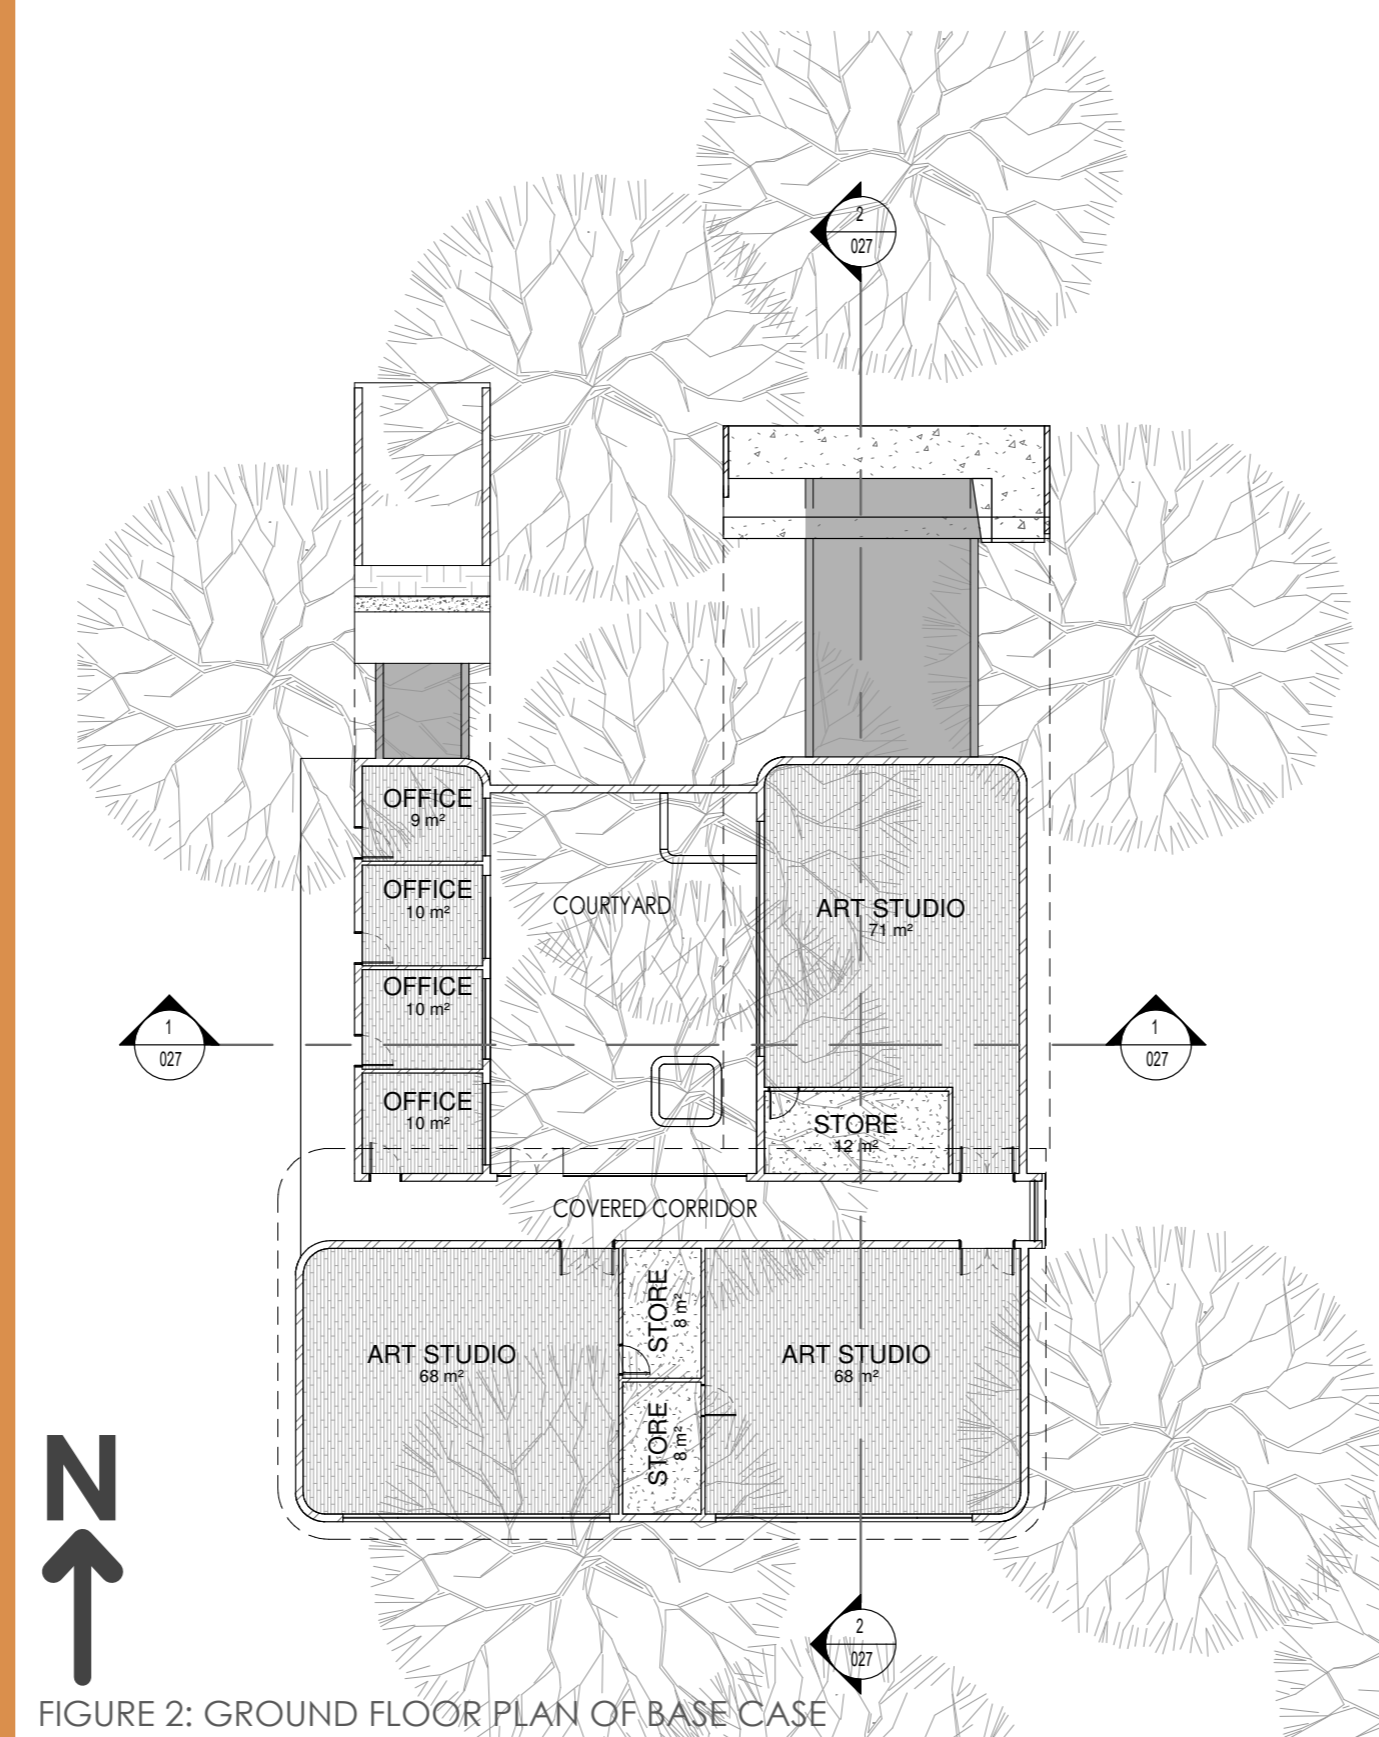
GROUND FLOOR PLAN OF BASE CASE
